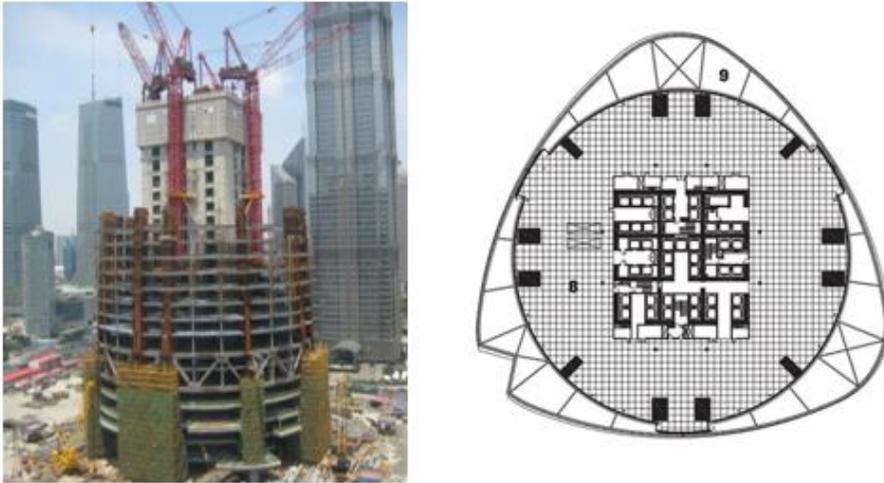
Shanghai Tower – during Construction Phase – Showing the Structure of the Building (left) and Characteristic Floor Plan of Shanghai Tower (right) [133, 97]
